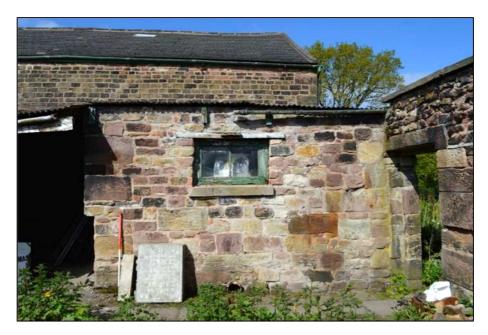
(Shot 15): East elevation of Building 3, looking west (1m scale)
